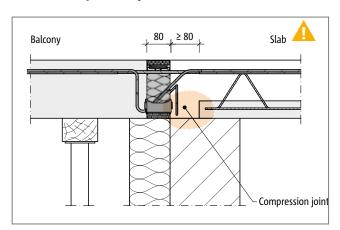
Schöck Isokorb® T type K-E, K-T: Installation in conjunction with prefabricated slab with wall support, compression joint on the floor side
